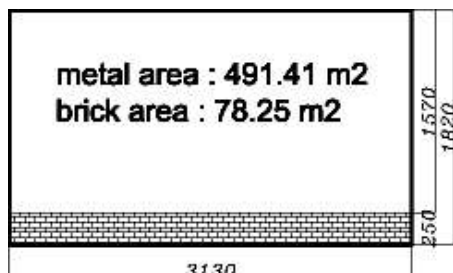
Indoor view of the left wall in turbine hall reverse plan of the power plant
